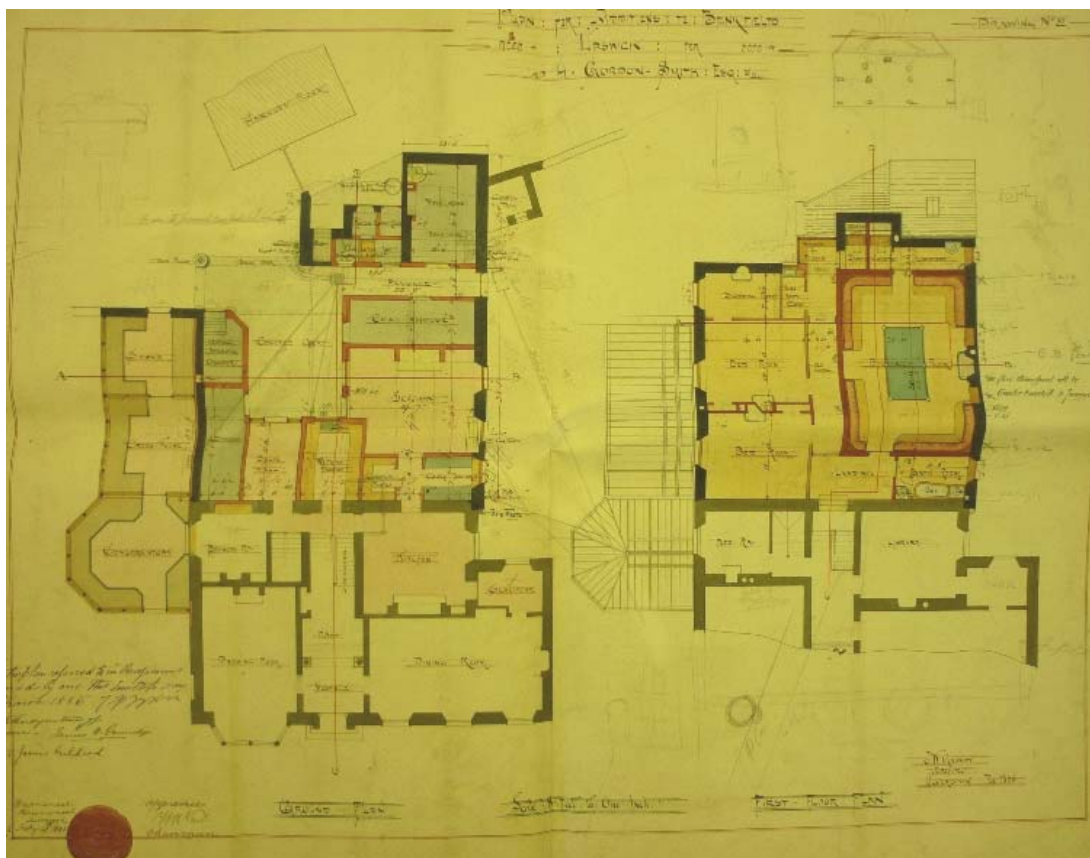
Plan showing proposed additions to Bankfield Hall, 1886 (CRO(B) Z1231 1886)
